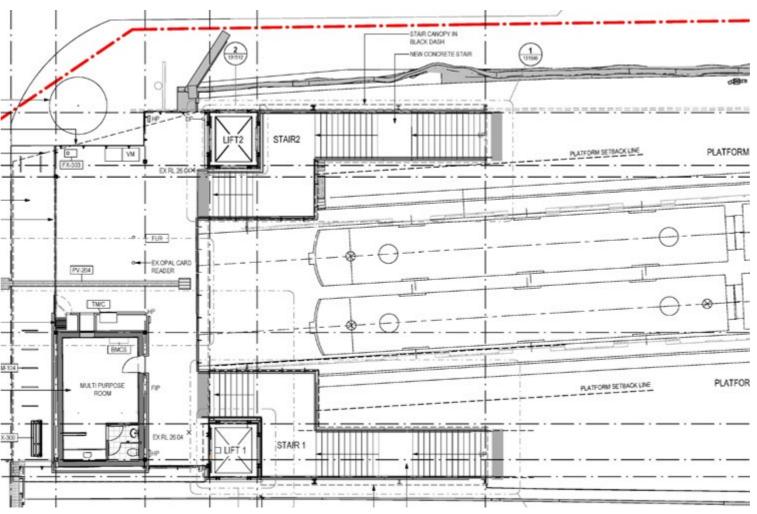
Concourse detailed plan extract showing new stair and lift configuration
